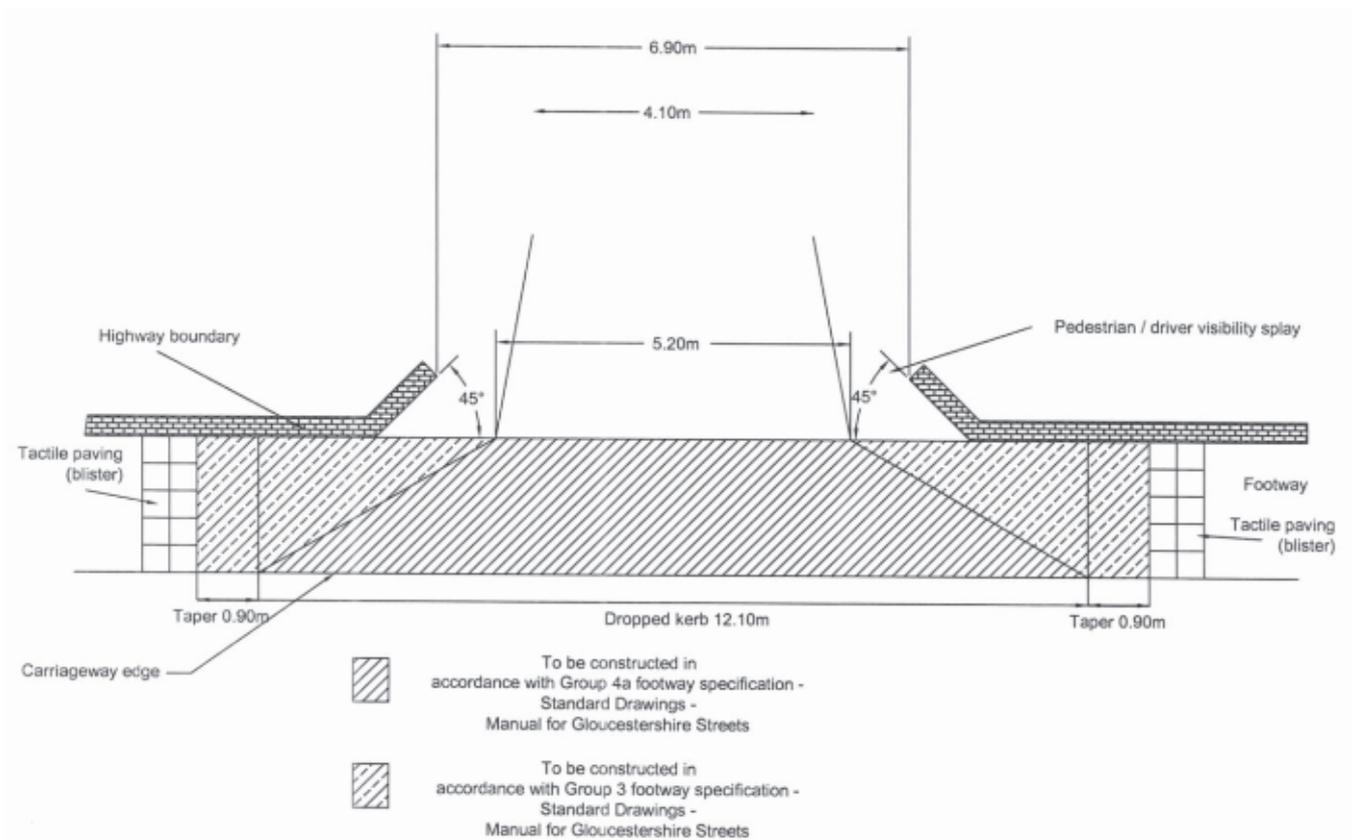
Standard access to 2 to 5 dwellings over footway (only to be used on Class 4 highway or below).
